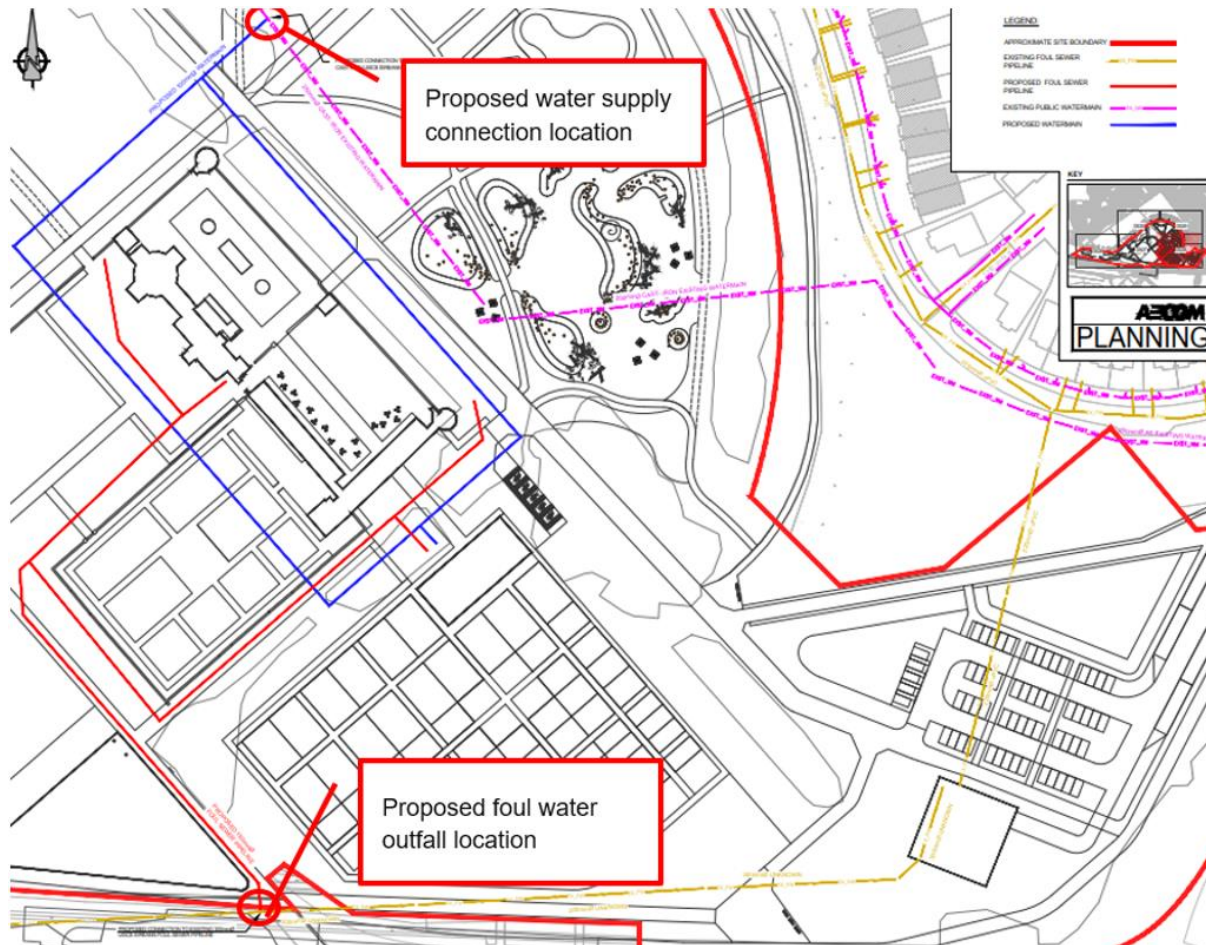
Proposed Watermain and Foul Water Connection Locations (Source: AECOM Drawing No. 60689541-ACM-XX-00-DR-CE-10-0528)
